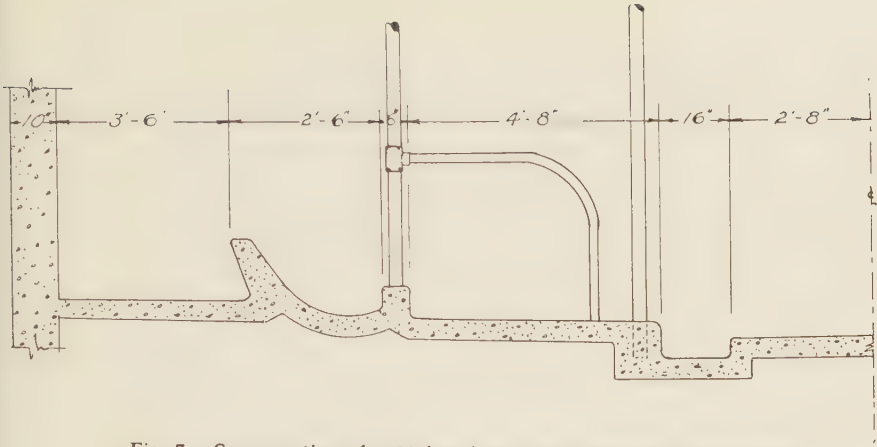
Cross section of a 32-foot barn with "face-out" arrangement.
